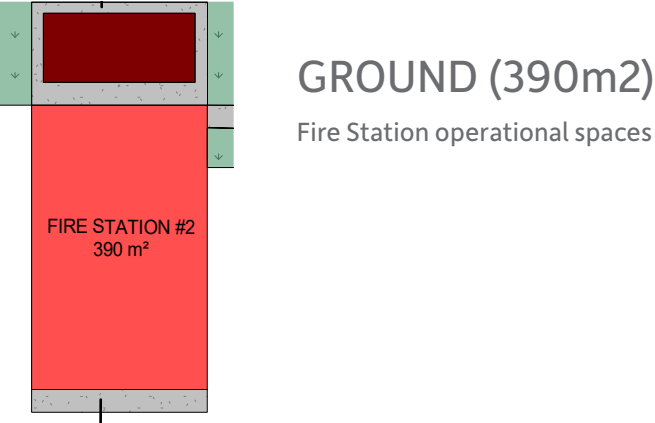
1903 Mt Newton Cross Road Site Concept: Site Distribution Concept 3
